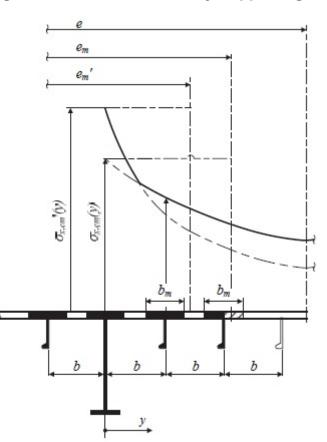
Stiffening Parallel to Web of Primary Supporting Member
